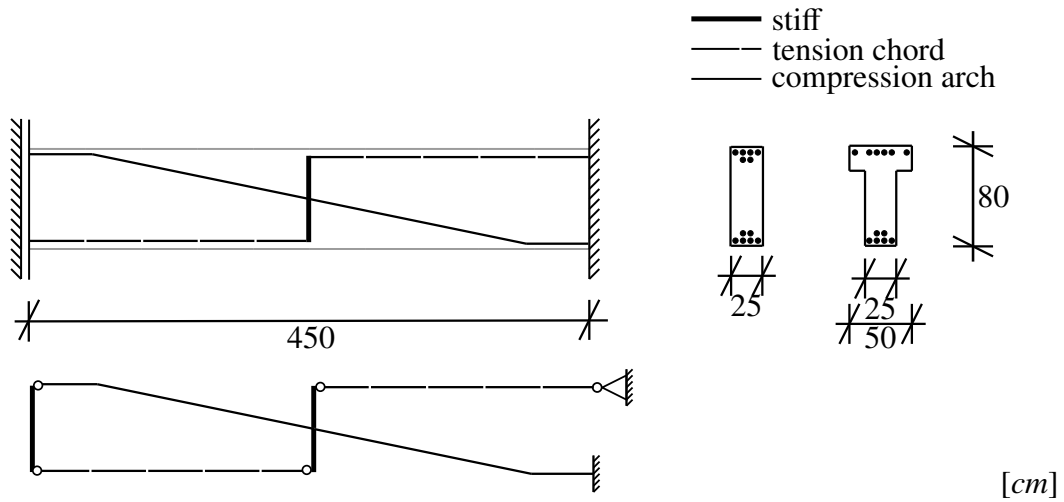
Dimensions of the cantilever tests [54] and the superposed theoretical model
